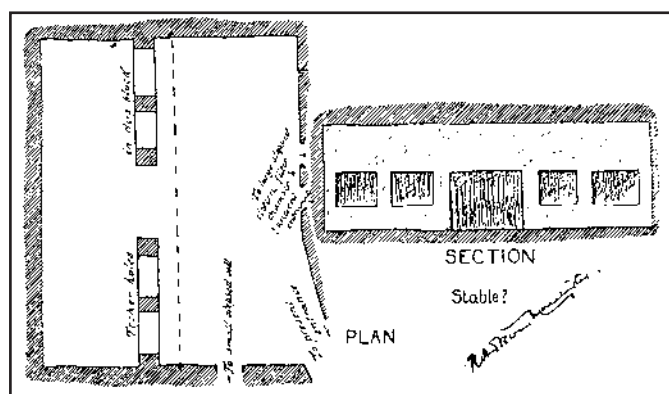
Plan and section of underground stable at Maresha (BLISS & MACALISTER, 1902).
